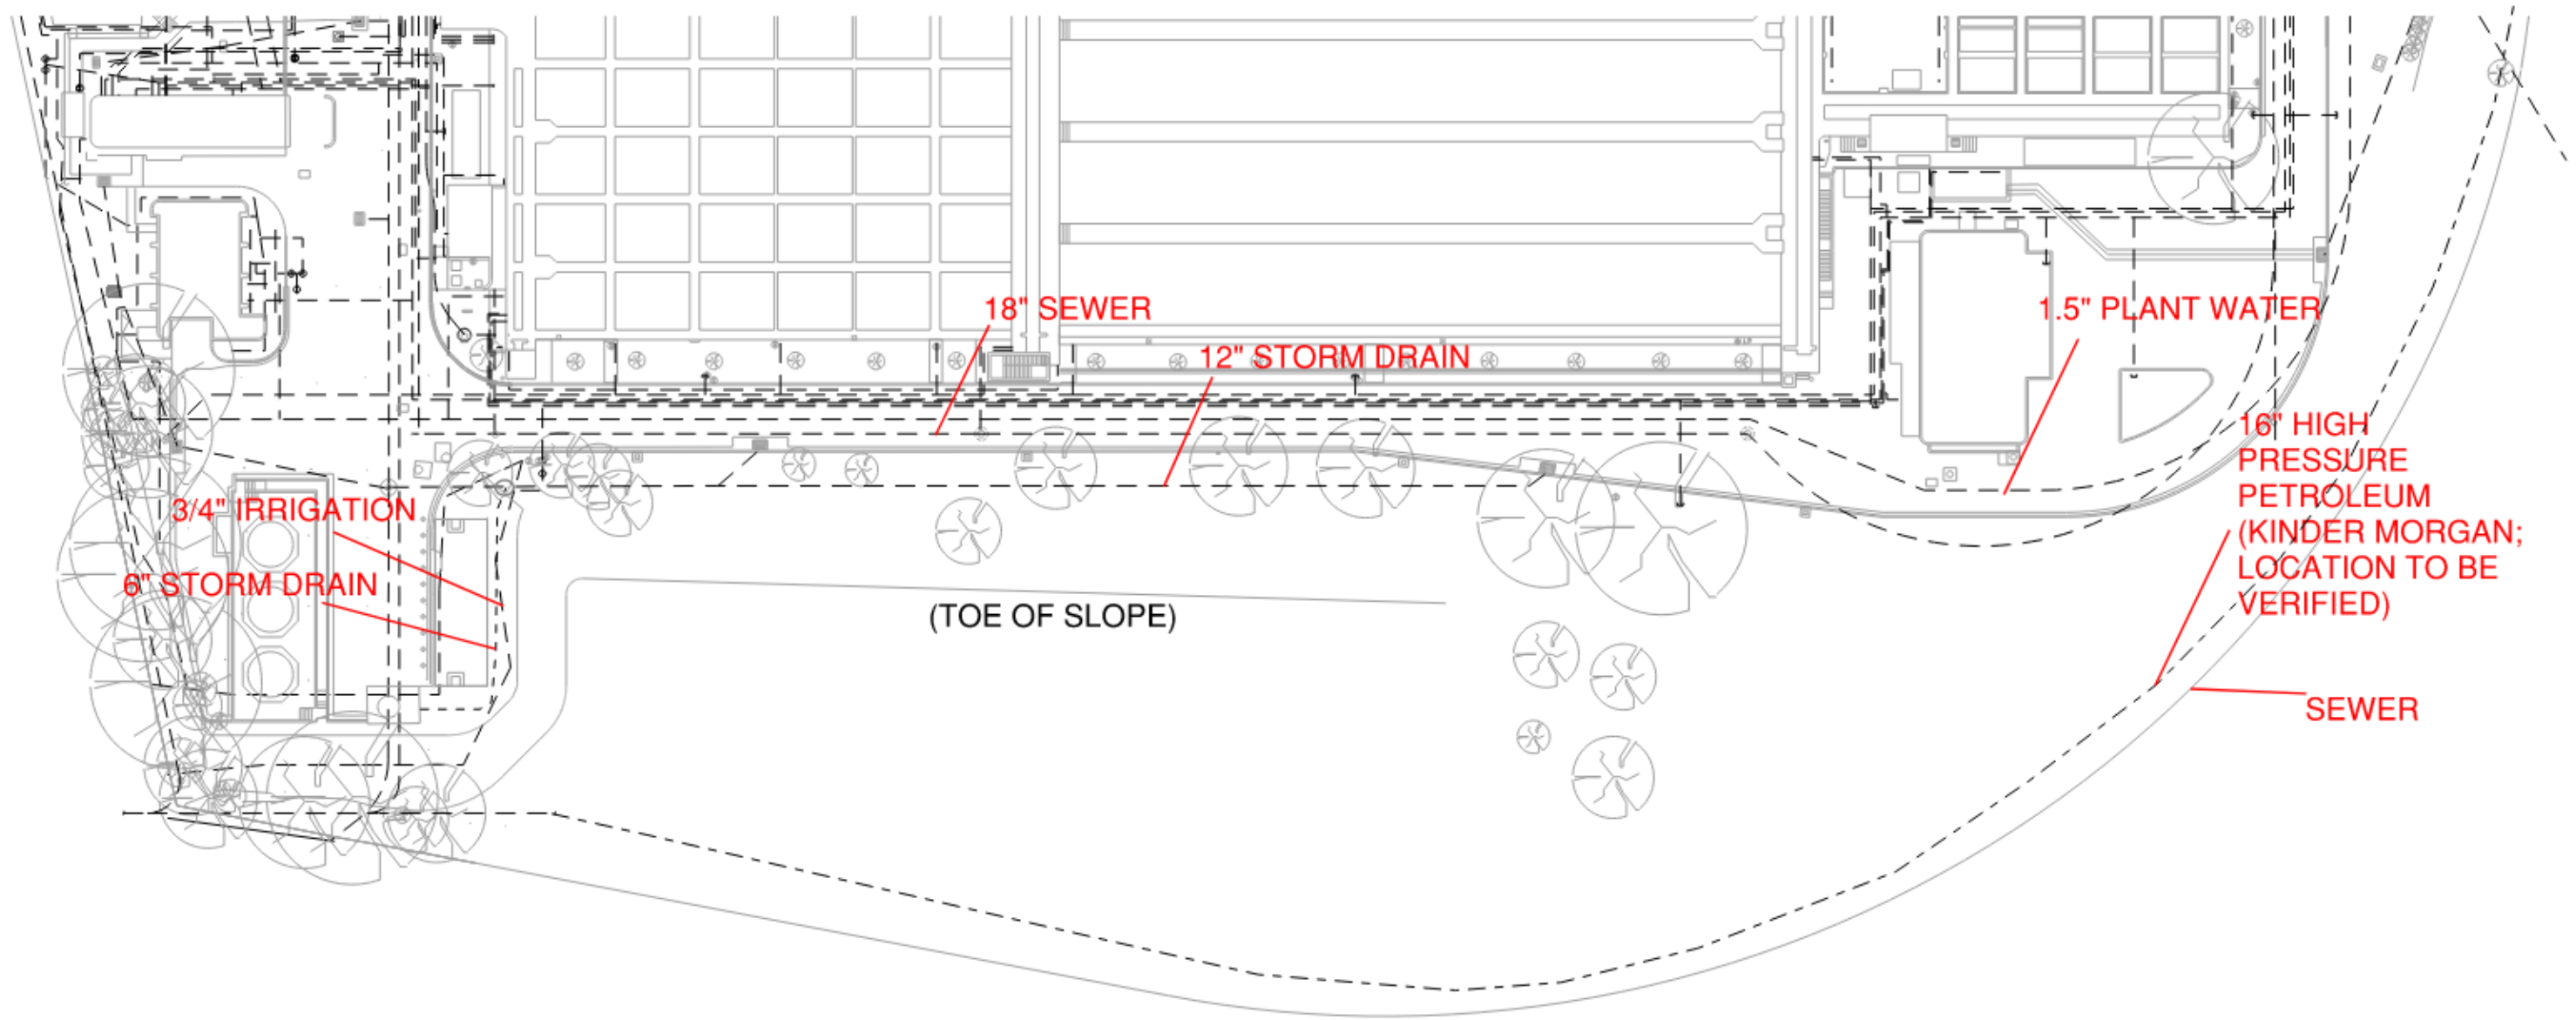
Yard Piping and Utilities at the Los Coyotes Water Reclamation Plant Site
